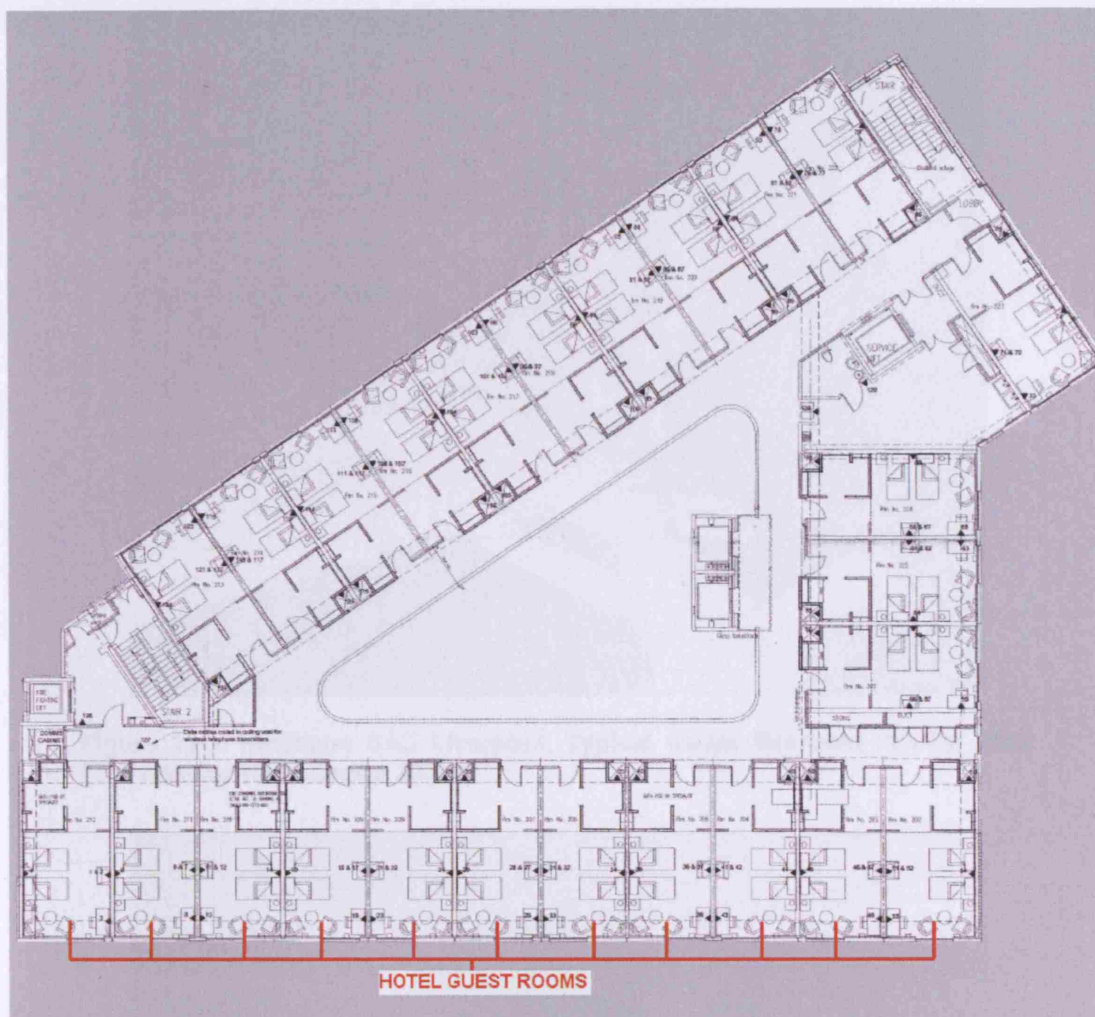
Second to Ninth Floors, Typical Layout, Radisson SAS Liverpool
